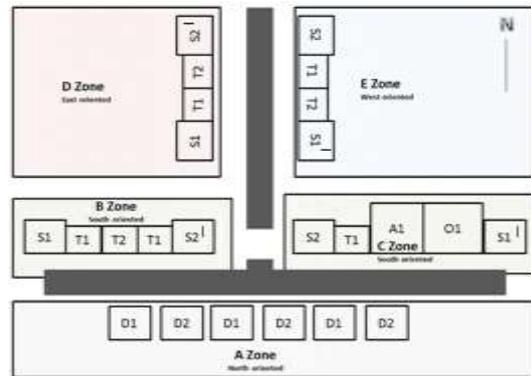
Neighbourhood case-study layout. In some semi-detached dwellings (S1' and S2') the side facades were switched due to windows that were on the facades that are adjacent to other buildings.
